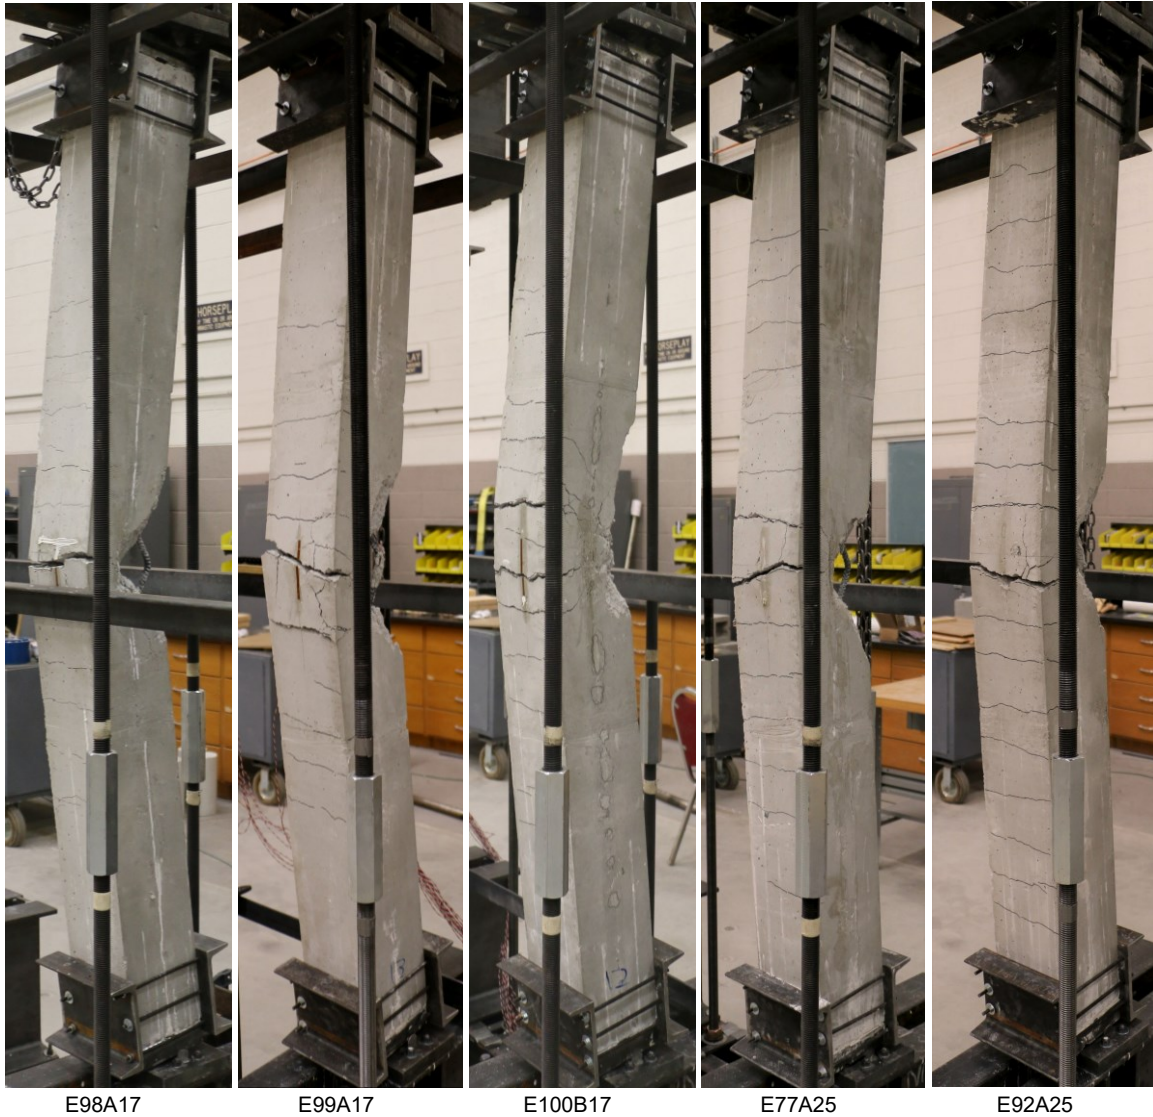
Damage and failure mode of eccentrically loaded columns.
